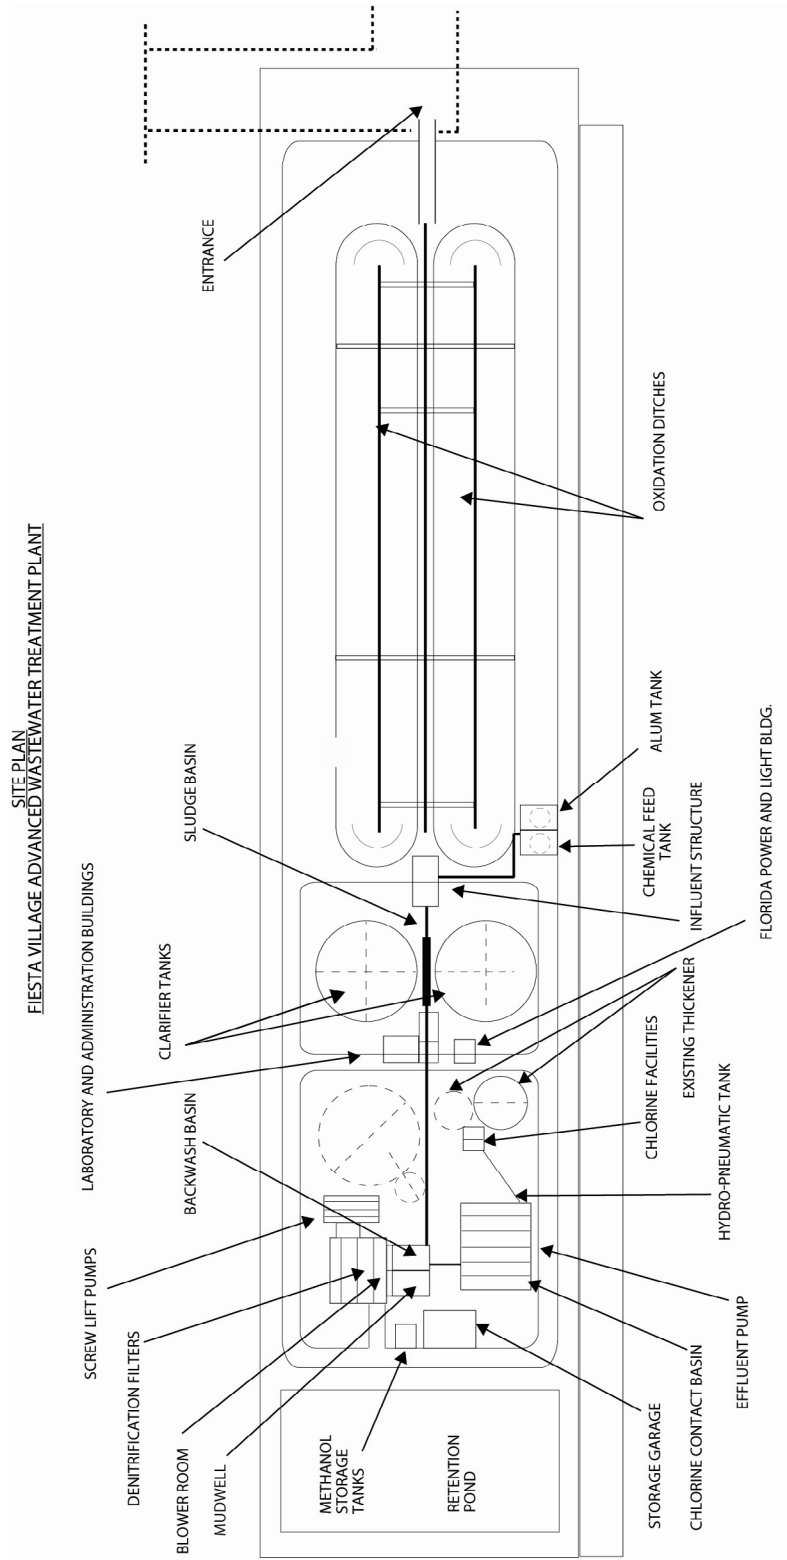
Site plan Fiesta Village Advanced Wastewater Treatment Plant.
